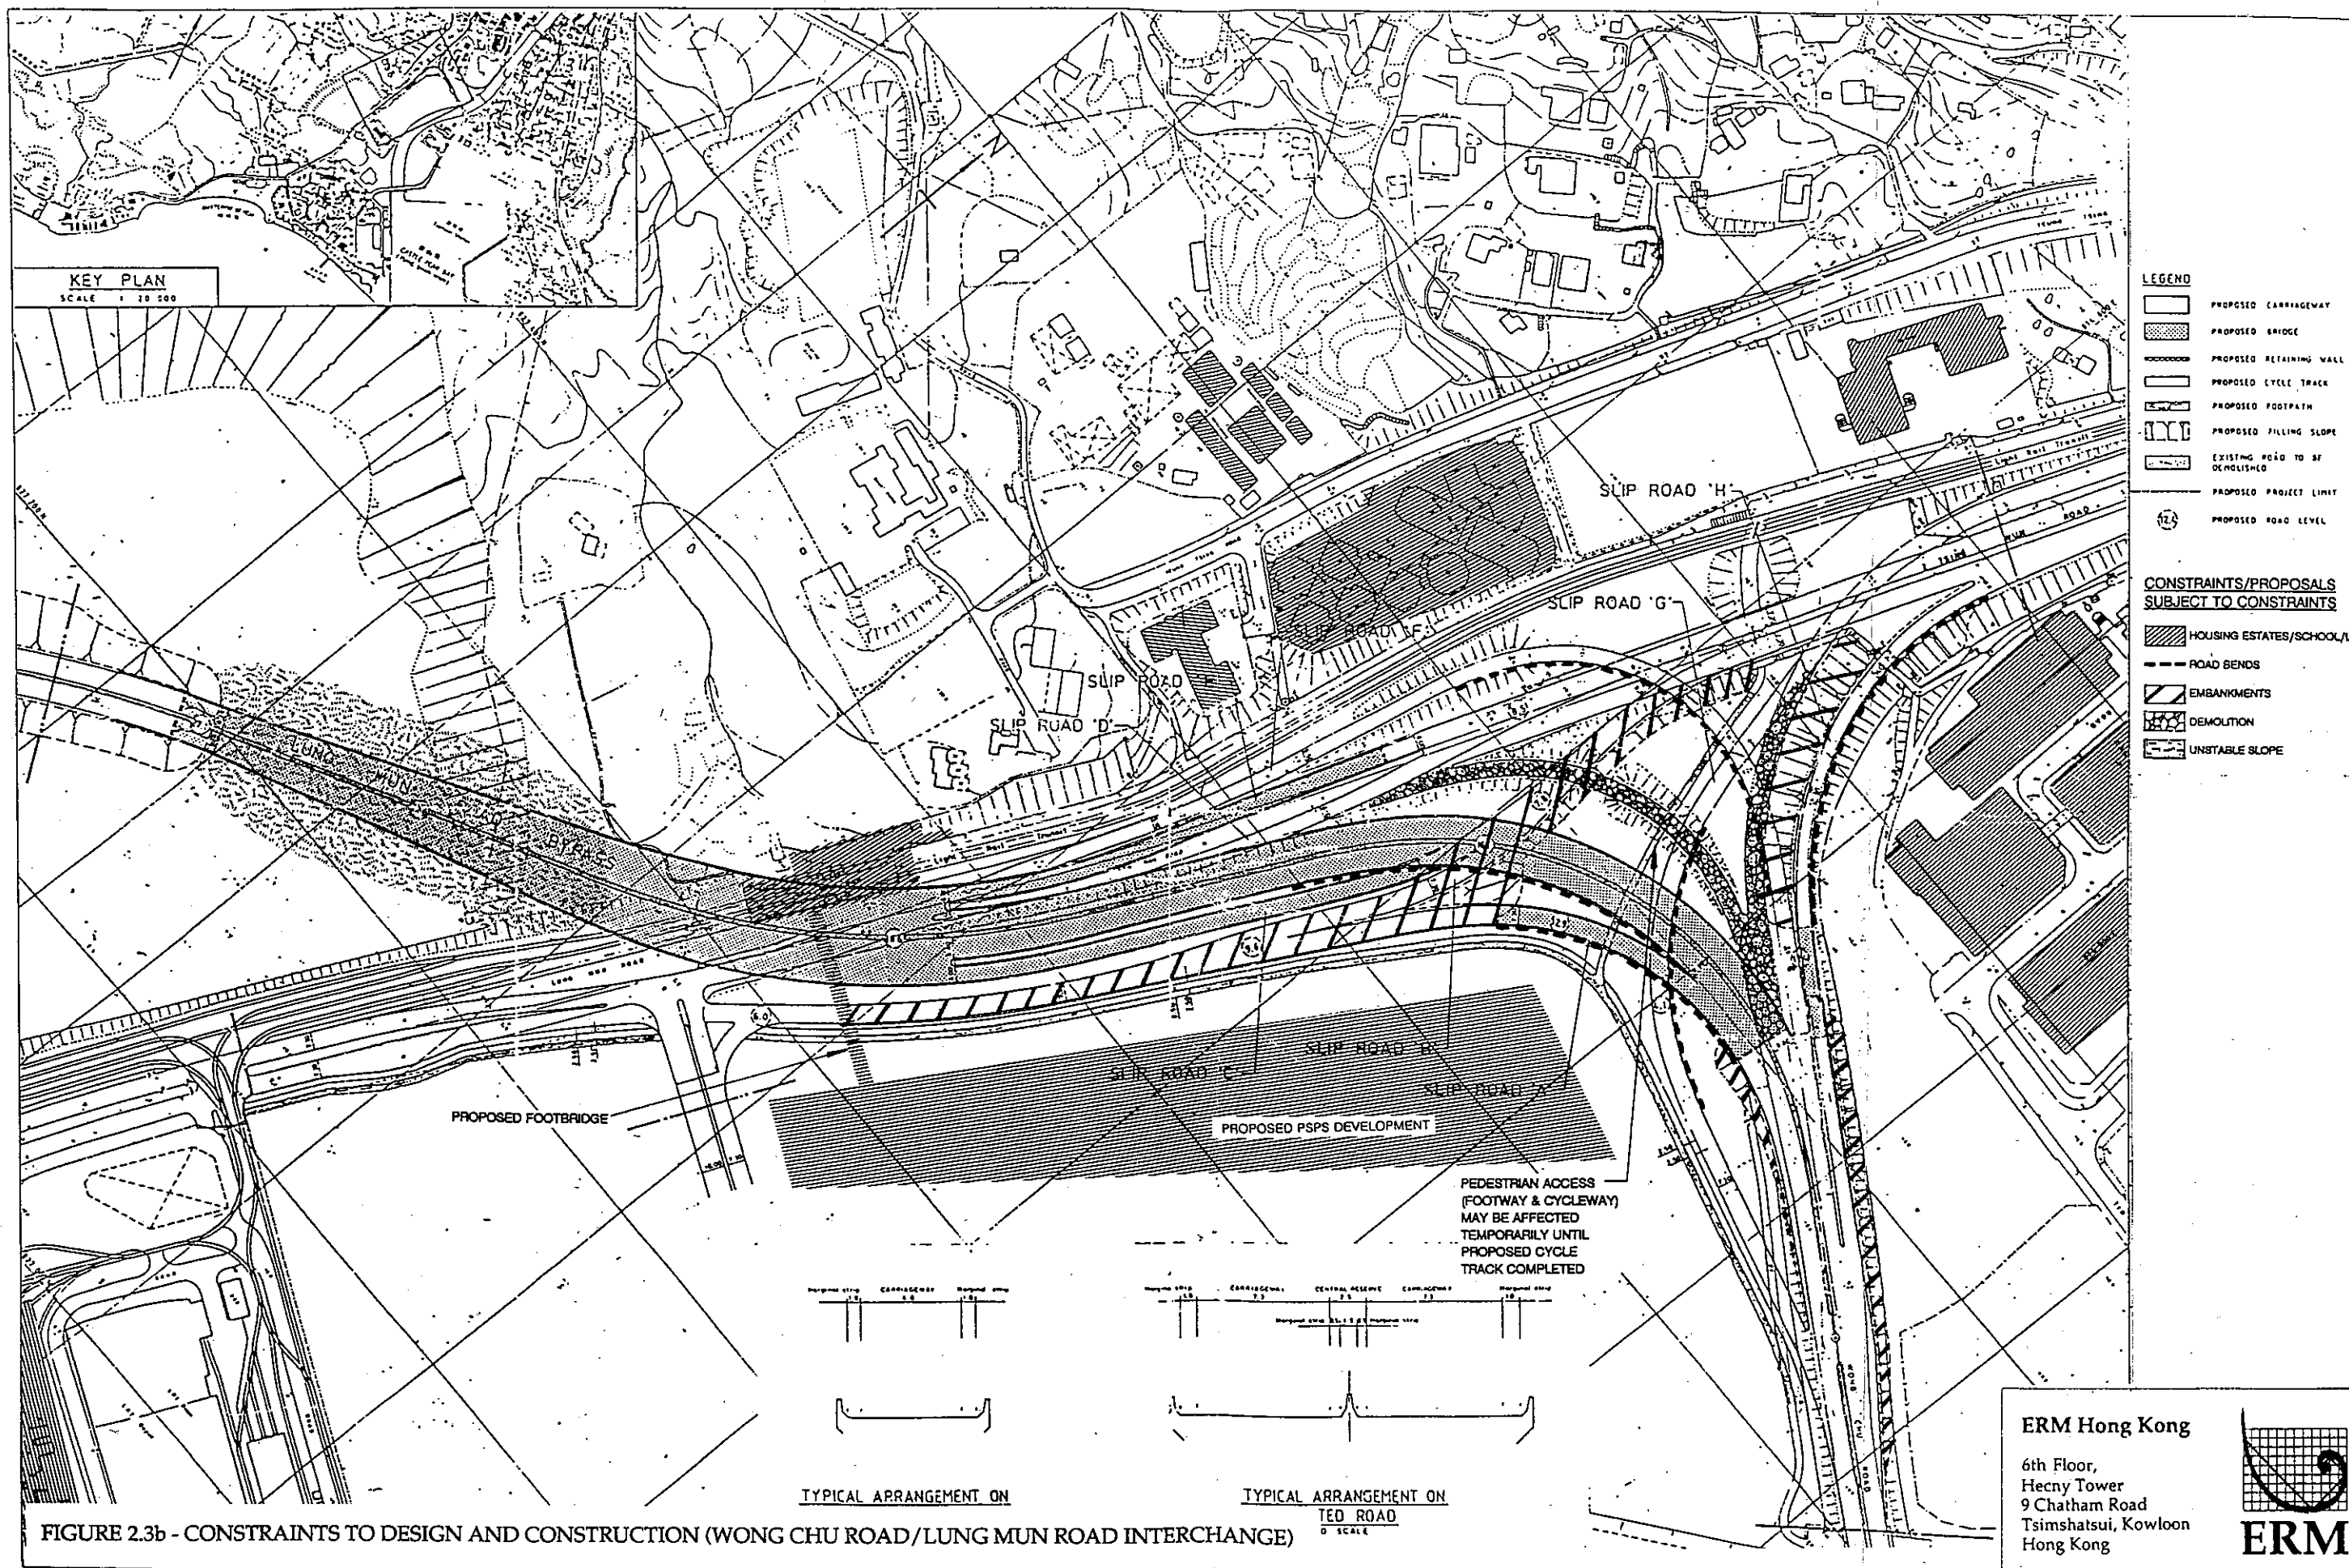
CONSTRAINTS TO DESIGN AND CONSTRUCTION (WONG CHU ROAD/LUNG MUN ROAD INTERCHANGE)
